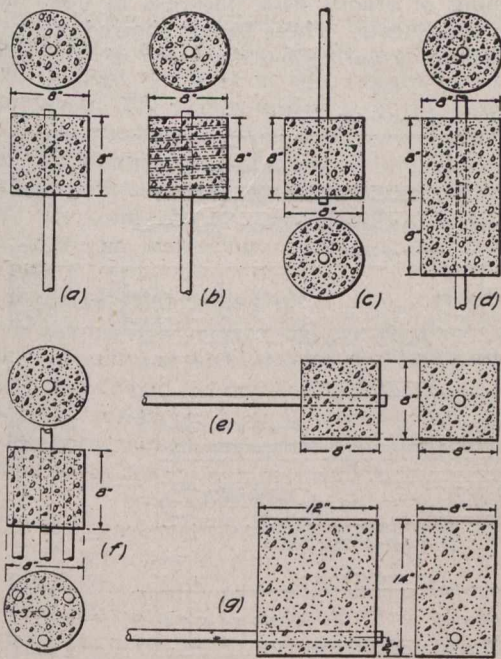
Types of Pull-out Specimens Used in the Tests.
